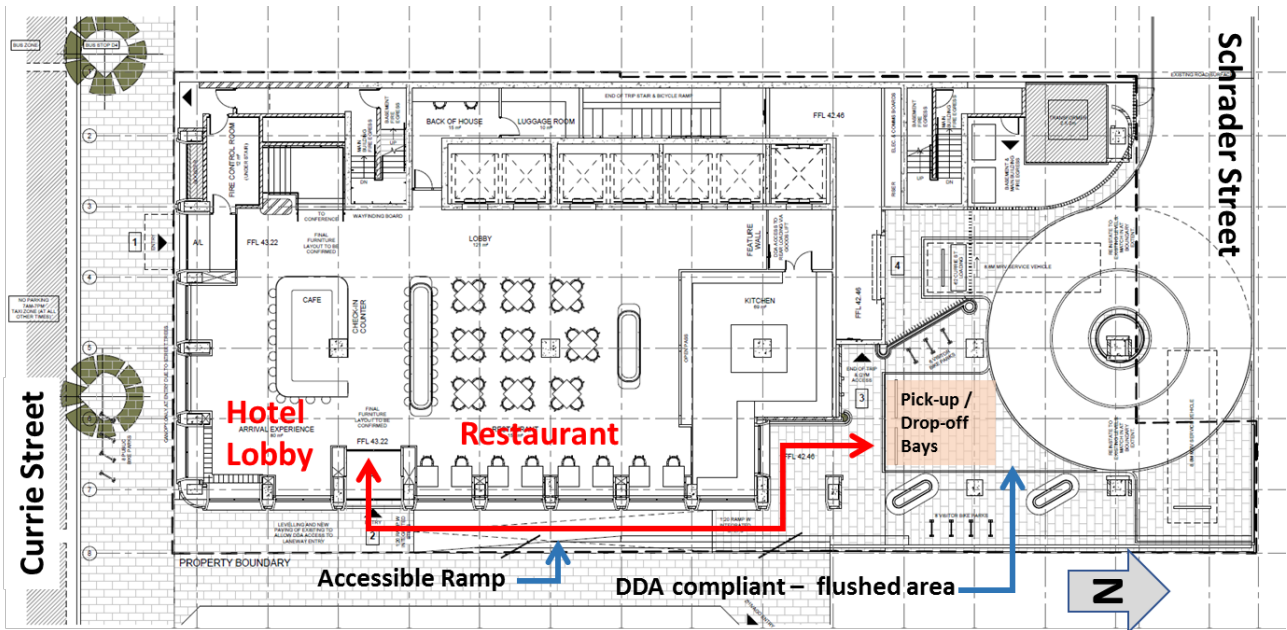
Schrader Street pick-up and drop-off – Pedestrian access arrangement
